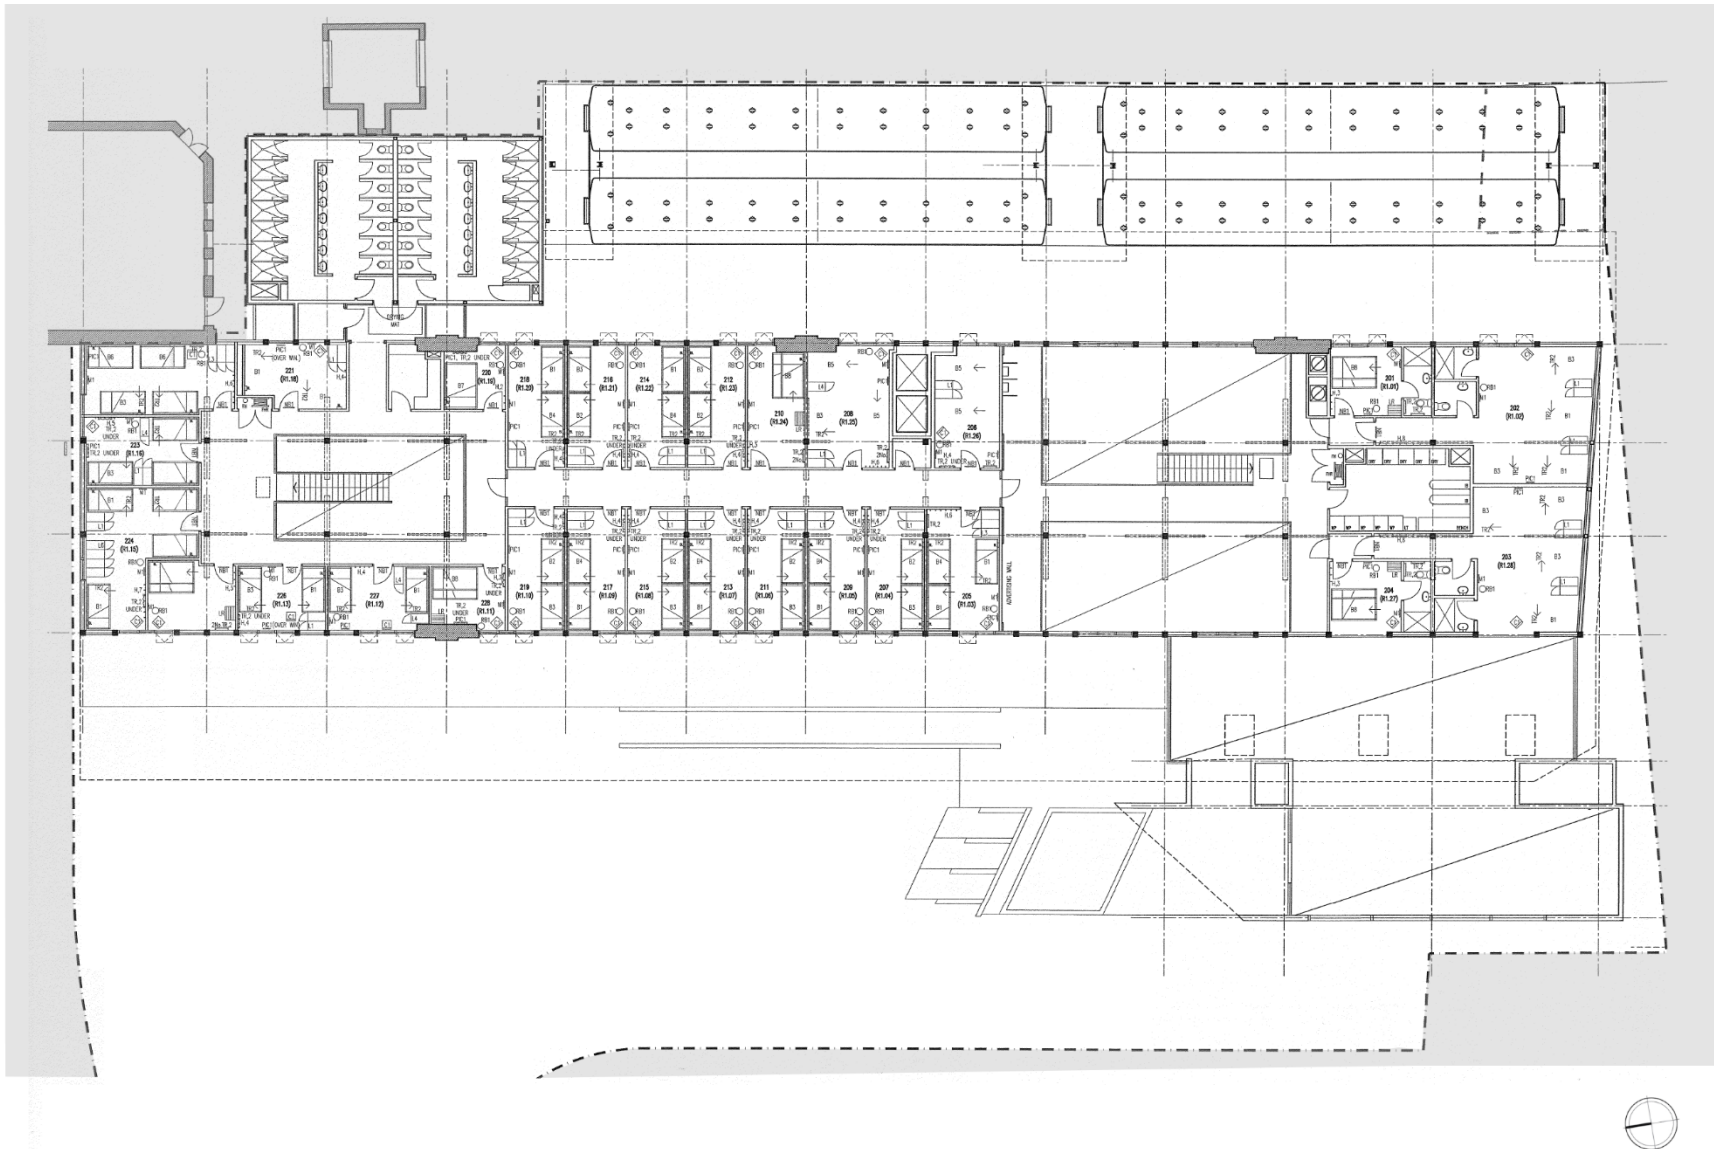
First Floor Plan (grey area is not included as part of the subject site)
